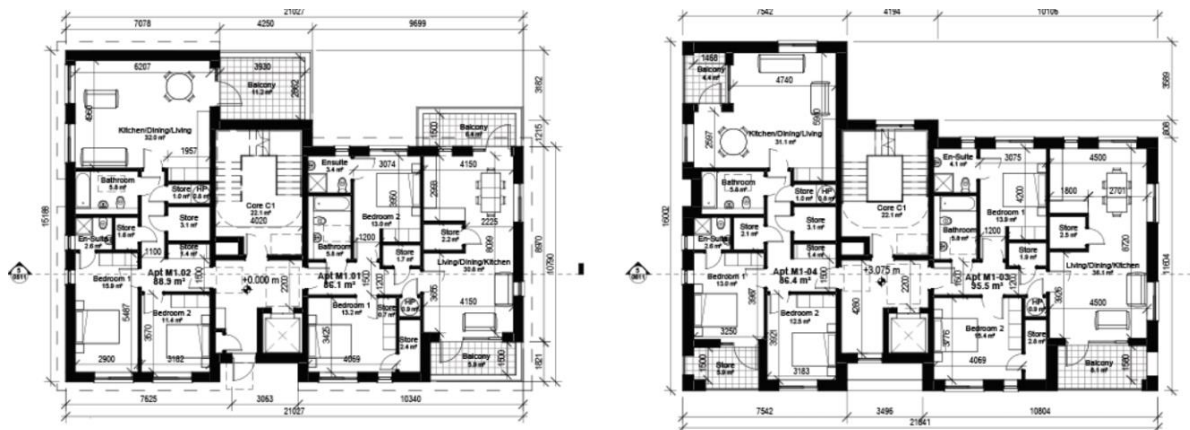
Proposed ground and first floor plans of Apartment Block Type M
